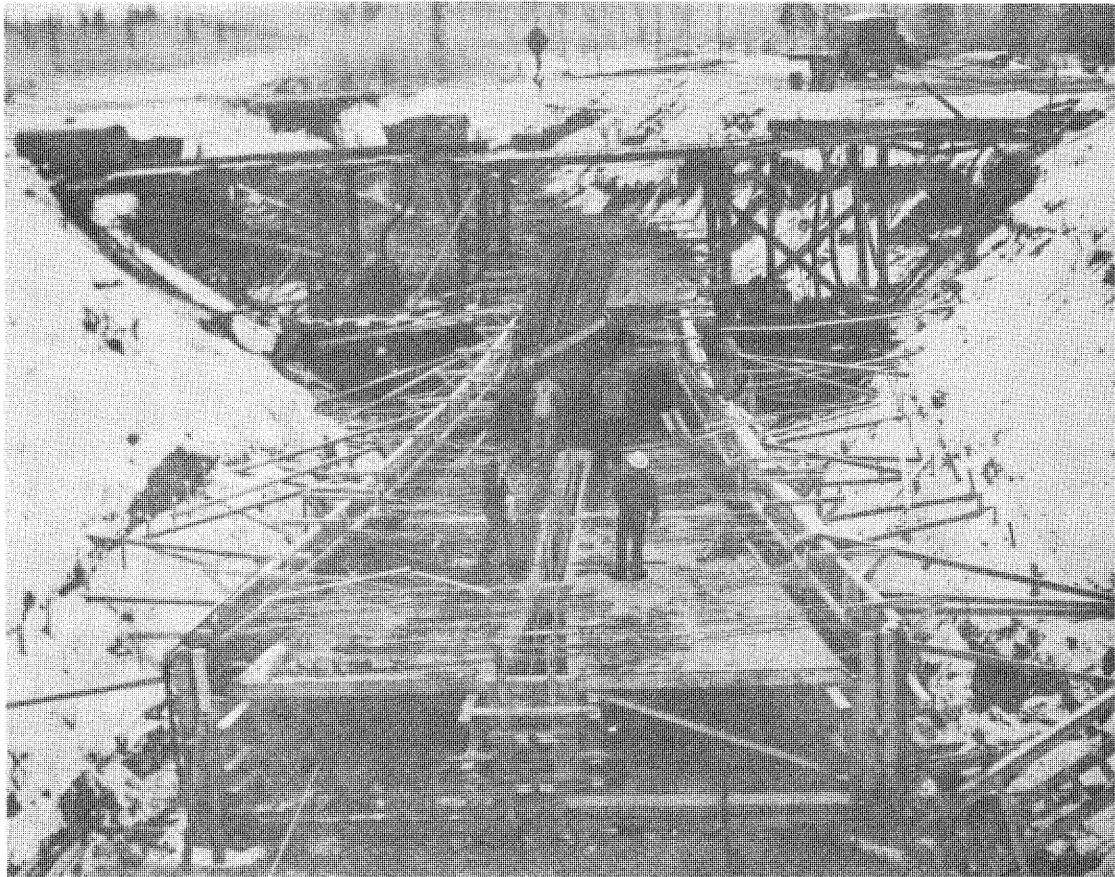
View north from Palmer-Anchorage highway, showing powerhouse footings and tailrace conduit tunnel with forms in place. P783-908-1129, October 25, 1952.
